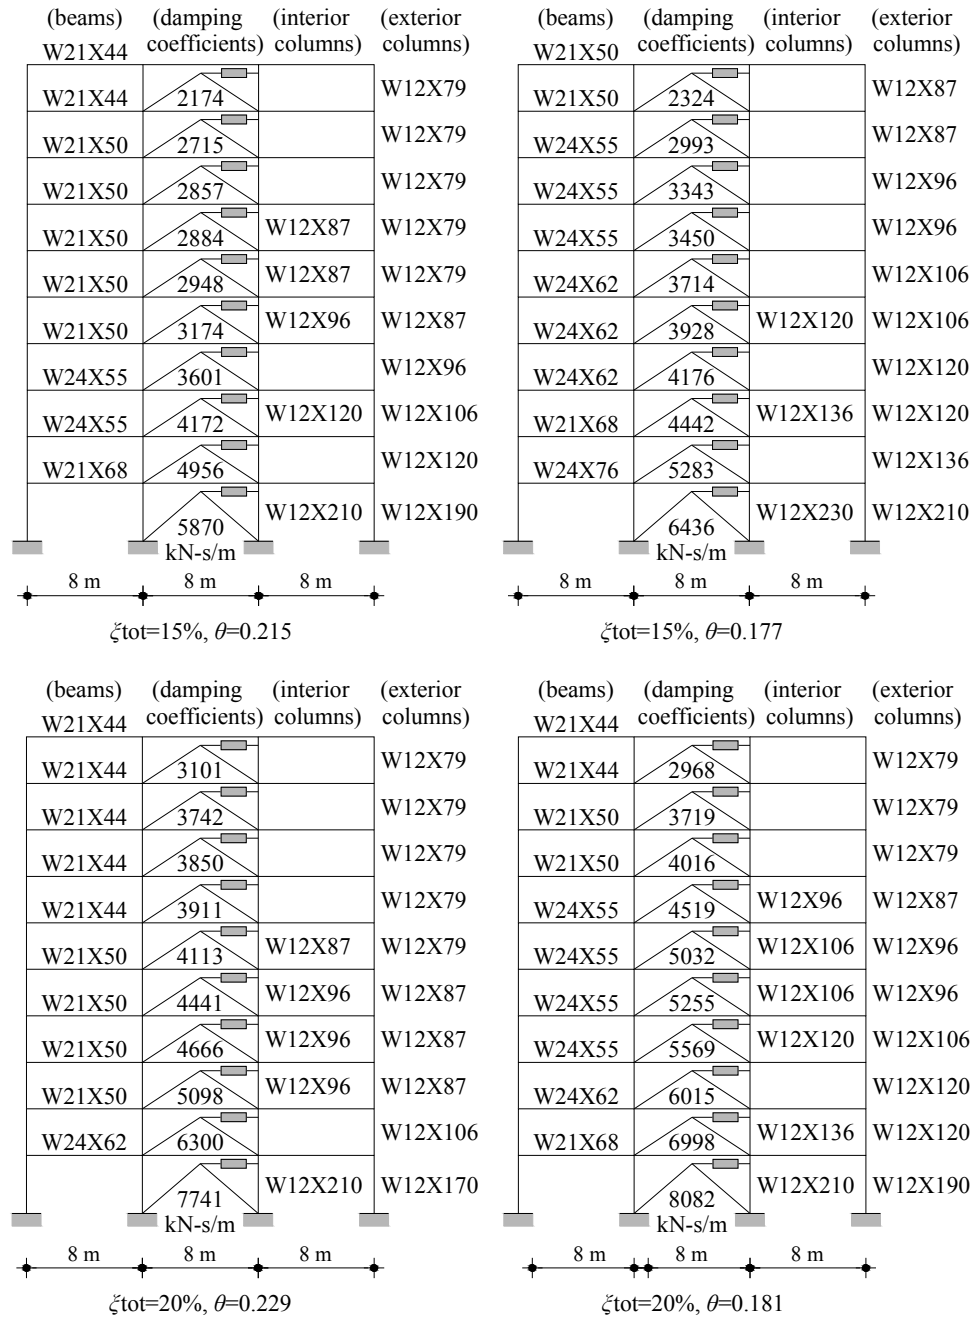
Elevation view and beam/column cross-sections of the 10-storey steel MRFs with viscous dampers. The damping coefficients of the viscous dampers are also provided. The interior column cross-sections of the MRFs with viscous dampers are the same with the exterior apart from the indicated
